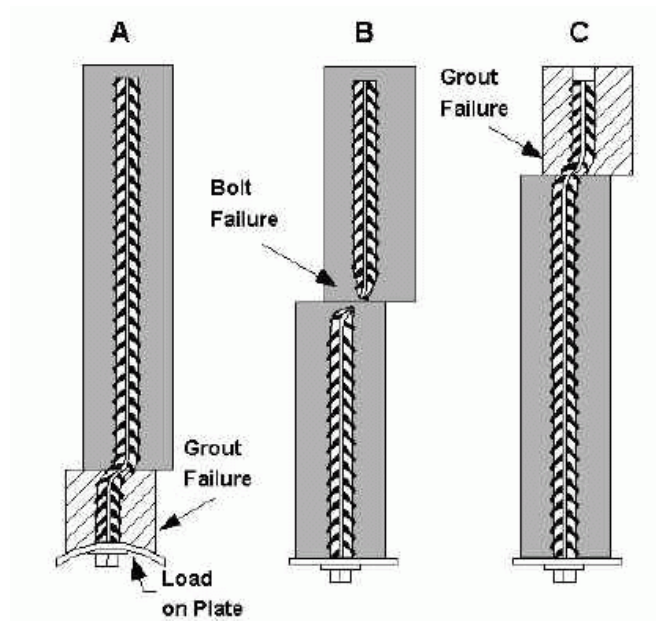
Failure mechanisms of a fully grouted roof bolt.
